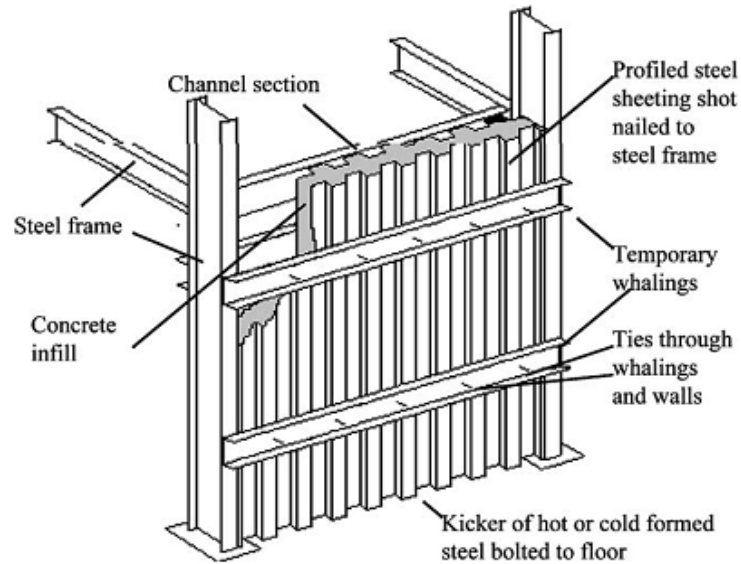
Schematic diagram of a composite walling system, (Hossain and Wright 2004a)
